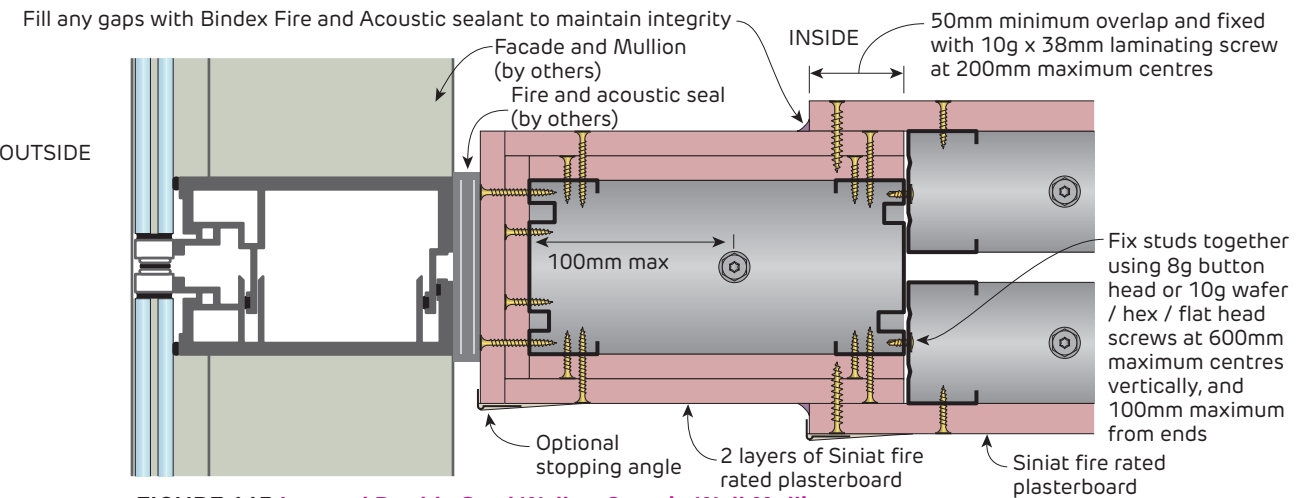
Internal Double Stud Wall to Curtain Wall Mullion
